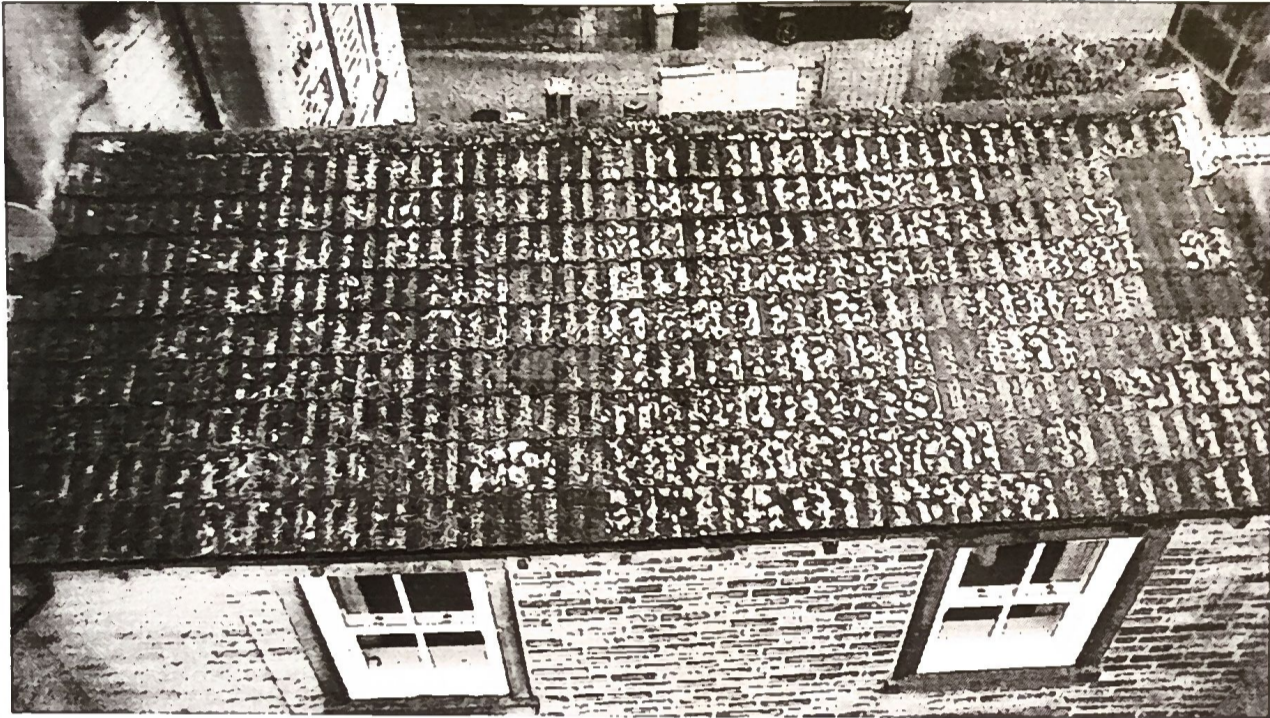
sightline, upward on Upperthong Lane HD93BQ and direct front
